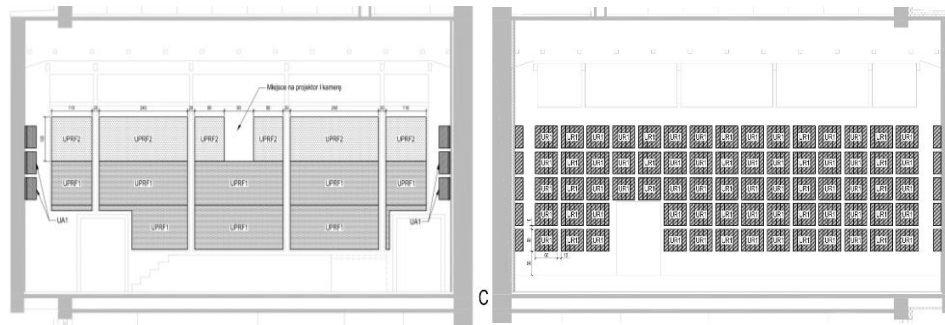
Section view of the back wall (left) and front wall (right) of the measured concert hall
